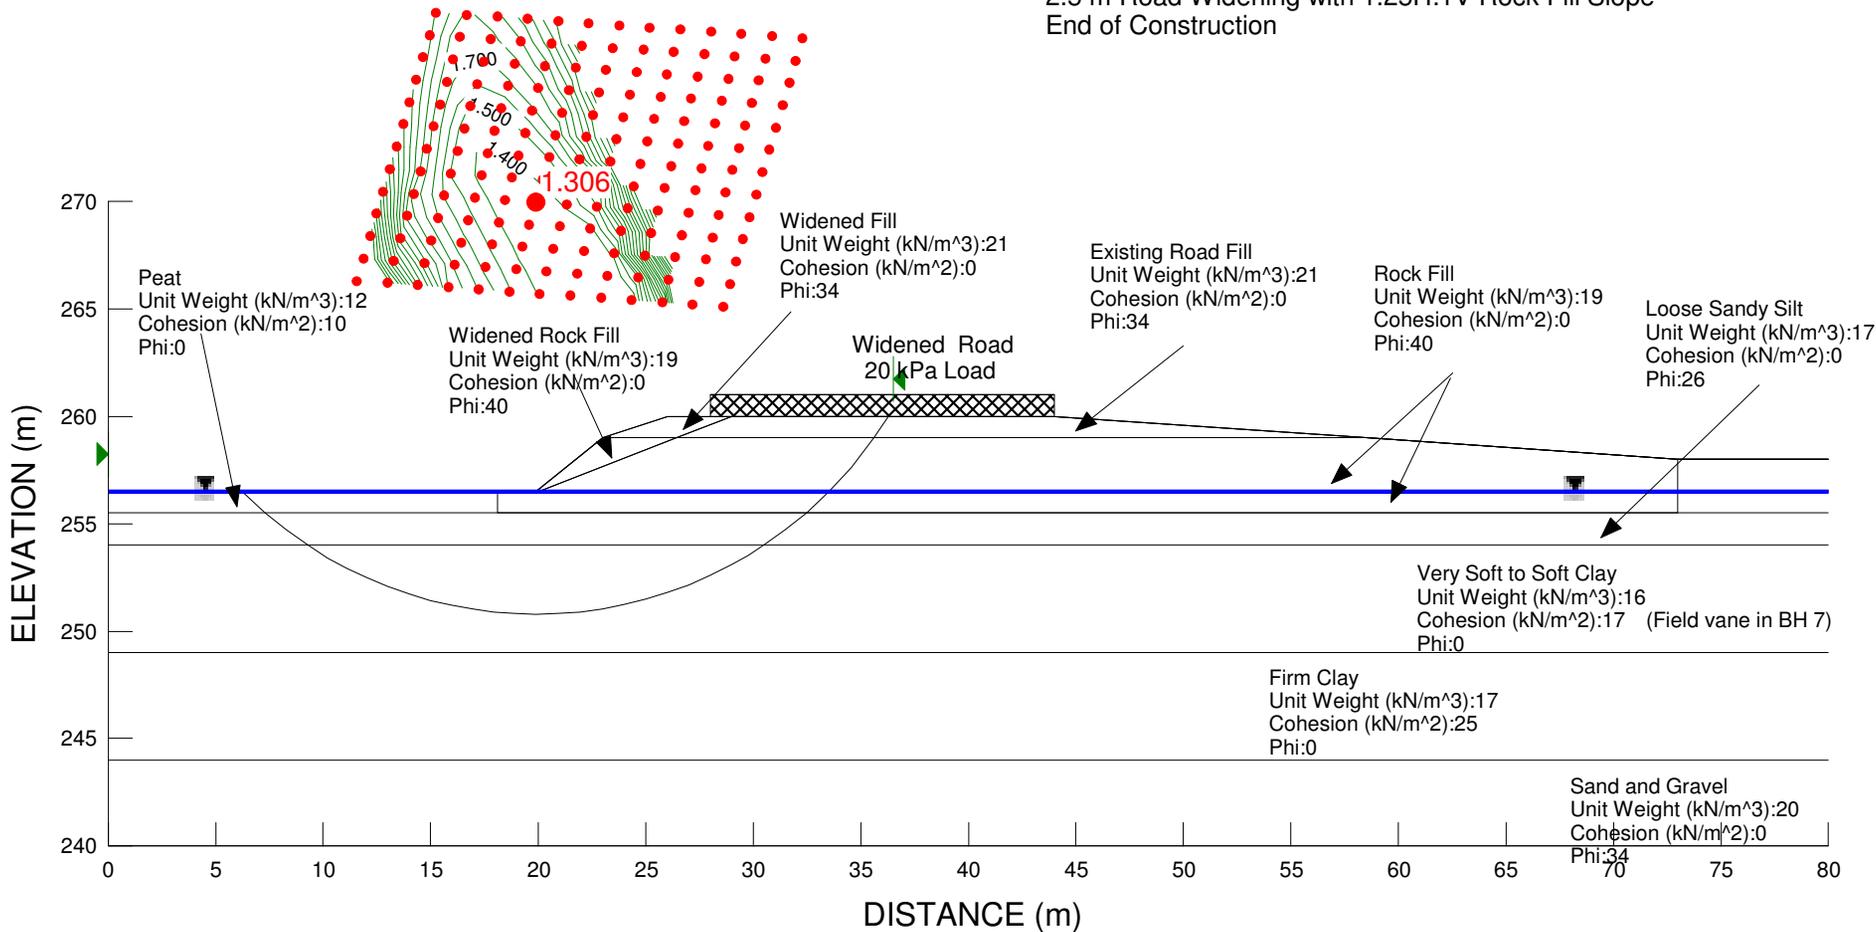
Slope Stability Analysis of Section at Station 18+975 - 2.5 m Road Widening (End of Construction - Slip Surface within Westbound Lane)
